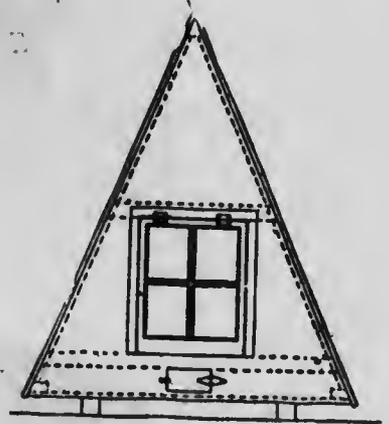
FRONT VIEW OF "A" SHAPED BROODER HOUSE AND COLONY COOP, SHOWING WINDOW HINGED TO TOP AND SMALL DOOR FOR CHICKS.
